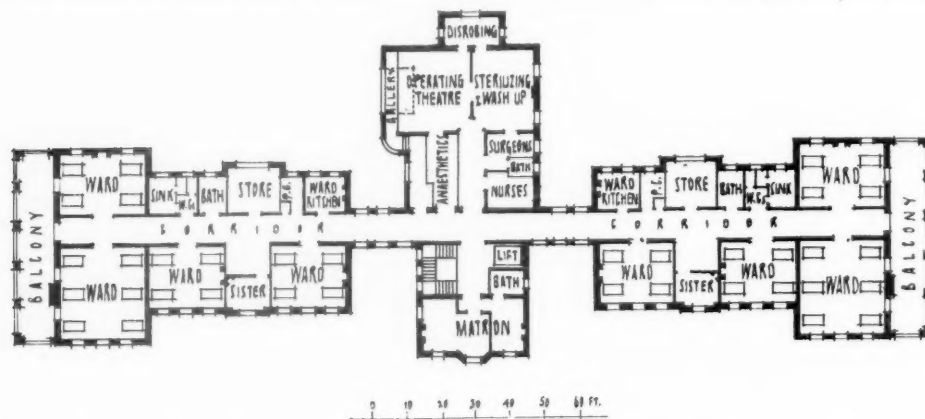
CHELSEA HOSPITAL FOR WOMEN: FIRST FLOOR PLAN. (Architects, Messrs. Young & Hall.)
